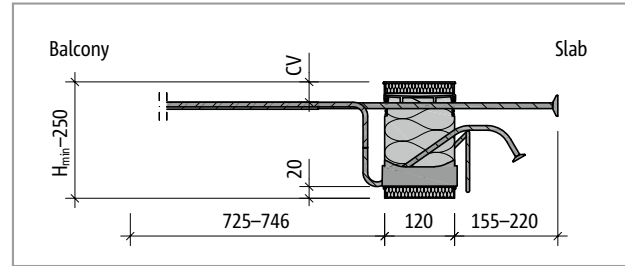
Schöck Isokorb® XT type K-U-M4: Product section
